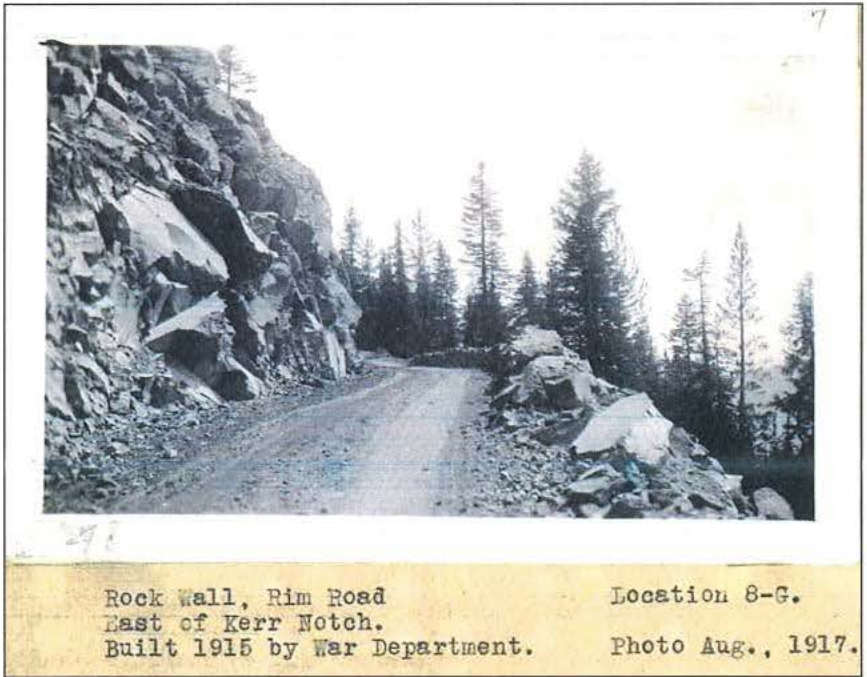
Dry-laid guard wall on Rim Road east of Kerr Notch, (Resource 18) 1917.
